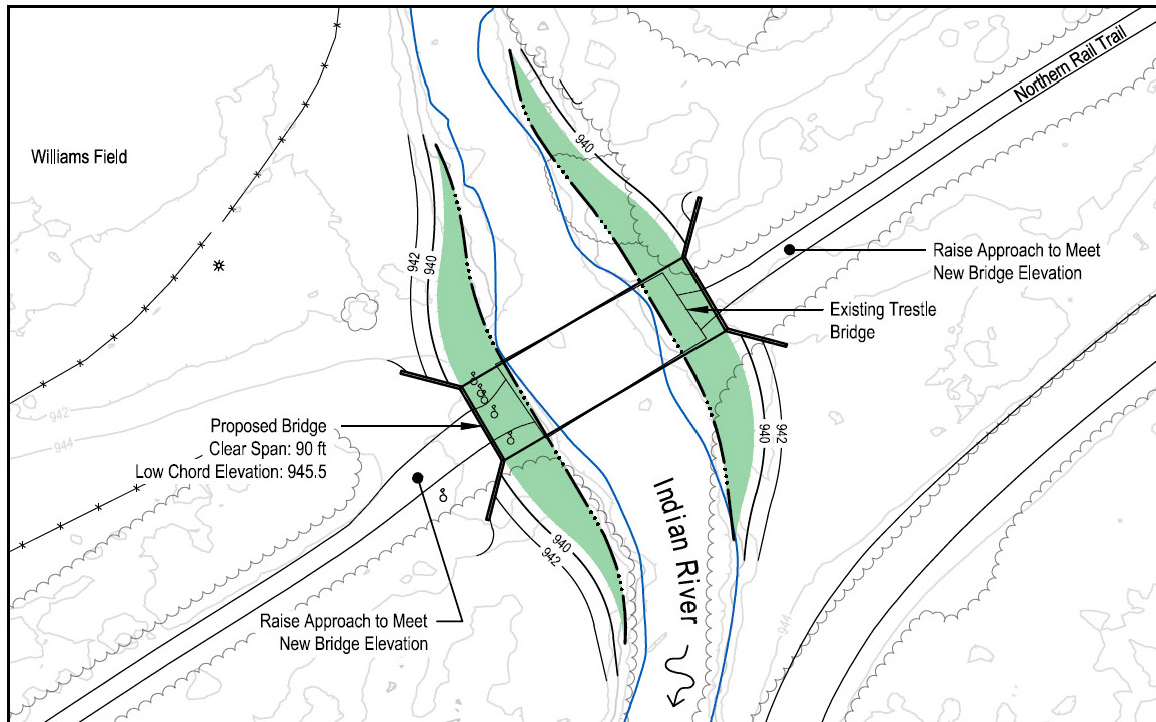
Conceptual site plan for 90-foot clear span bridge at the upstream Rail Trail crossing
